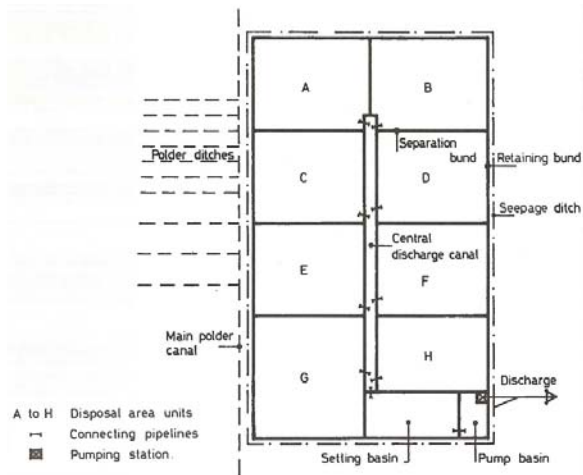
Typical layout of a disposal site for dredged sludge (D'Angremond et al, 1978).
